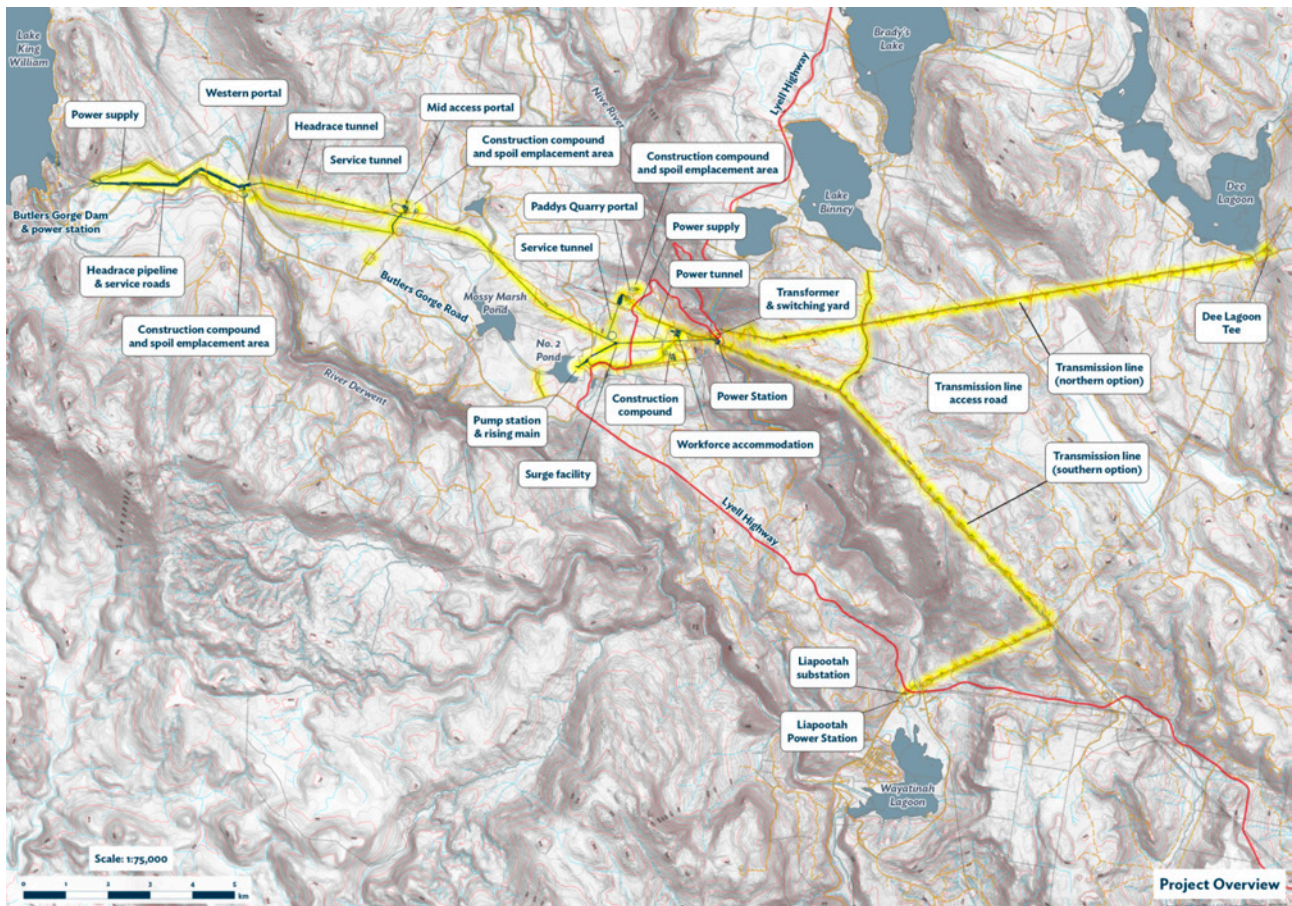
TARRALEAH REDEVELOPMENT - PROPOSED LAYOUT PLAN
